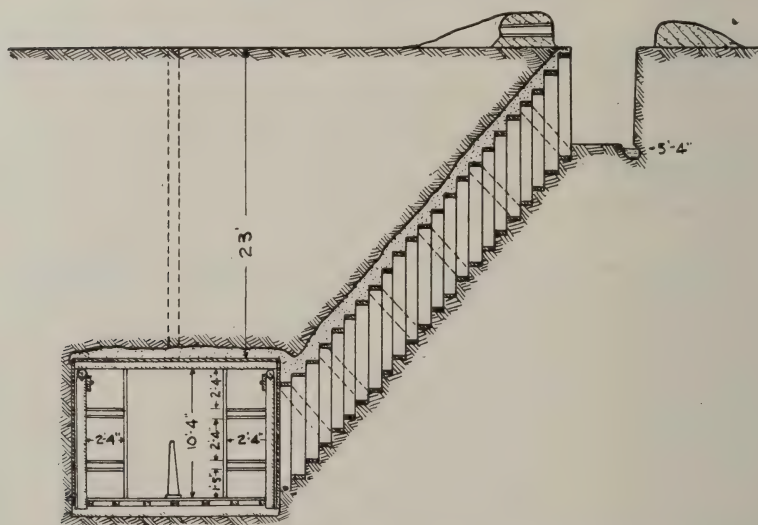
Cross-section of a cave shelter and entrance gallery.
